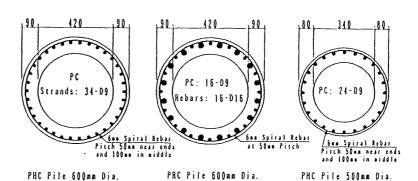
Cross-section of PHC and PRC Piles. (Prestressing strands, spiral ties and rebars are also shown.
